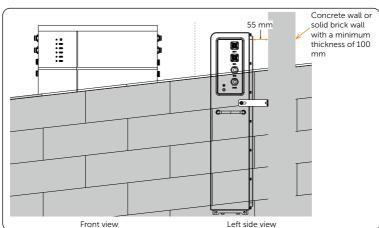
Fixing L-shaped wall bracket to the battery pack
